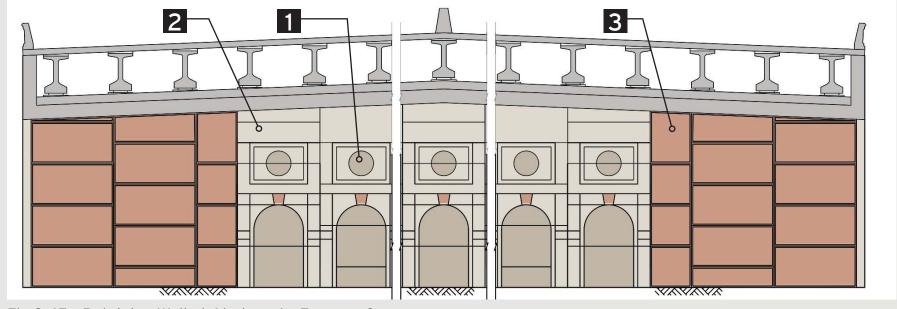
Retaining Wall at Abutment - Freeway Overpass
